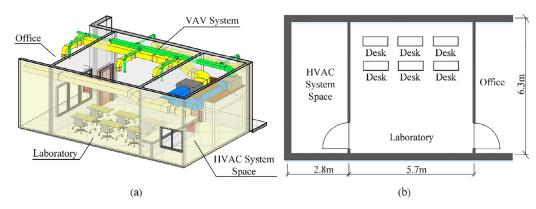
Building model of environmental chamber: (a) 3D building model; (b) floor plan.
